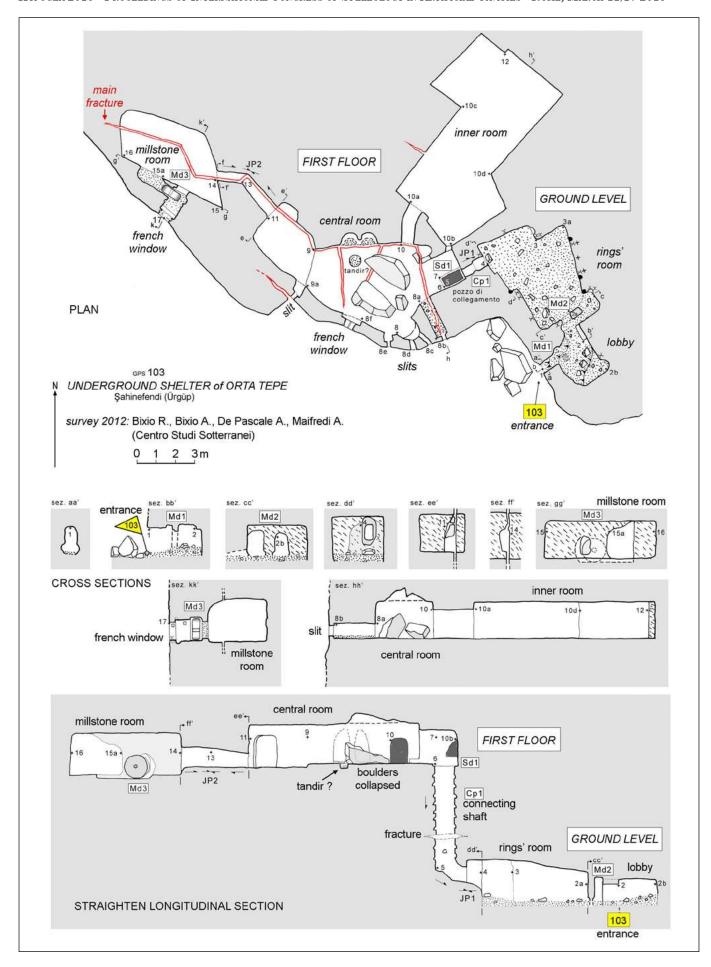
Şahinefendi, plan and sections of the vertical refuge in Orta tepe cliff (archive Centro Studi Sotterranei).
